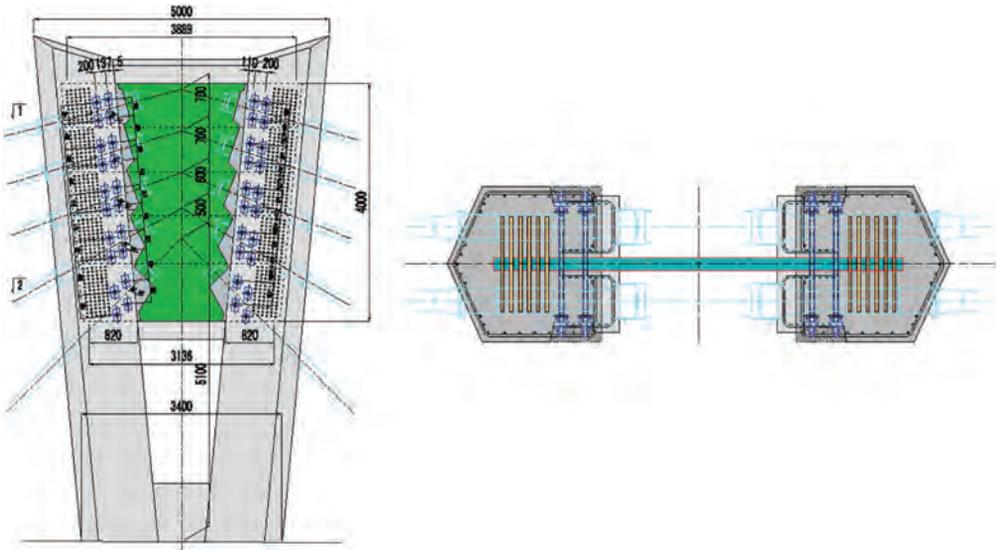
Single plate anchorage (Mukogawa Bridge)
